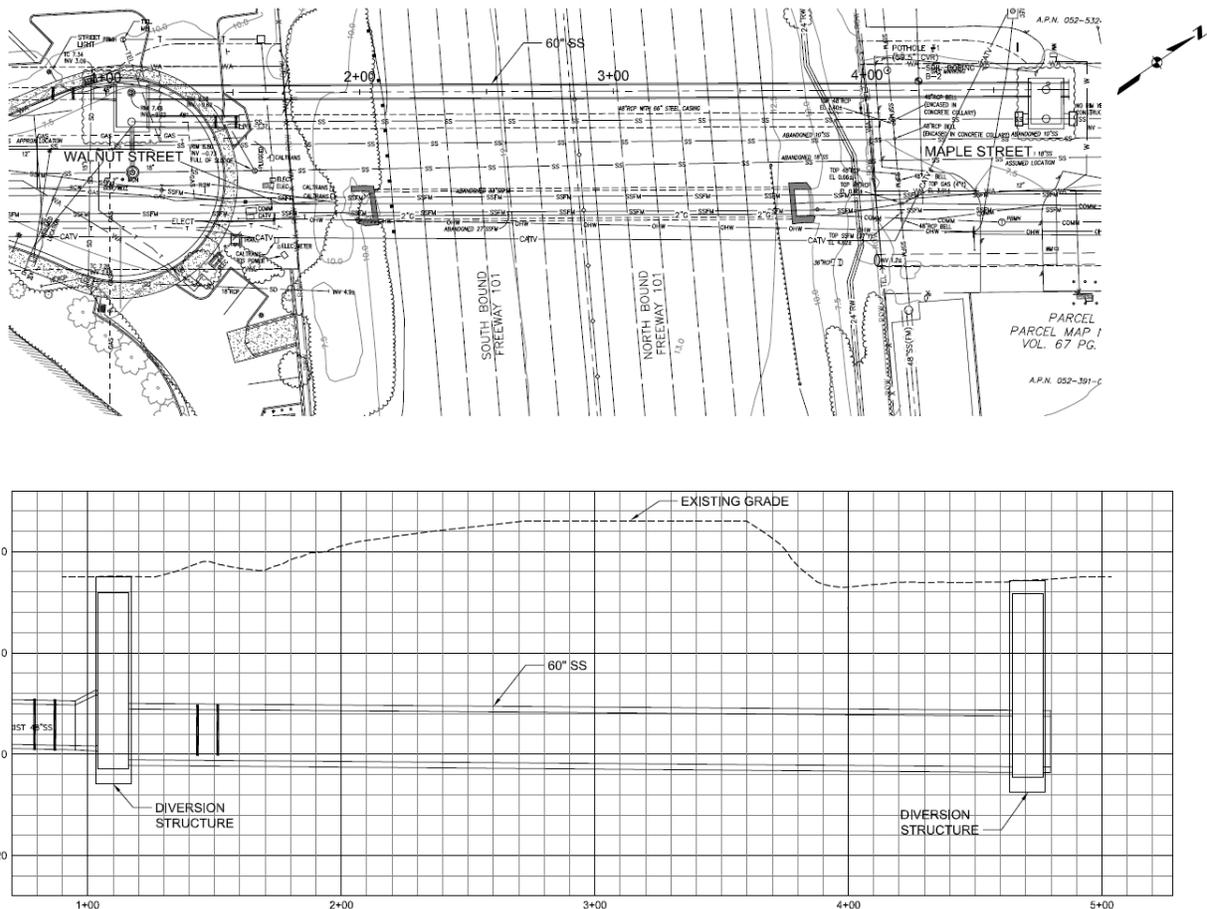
Simplified Plan and Profile of the Walnut Street Interceptor
